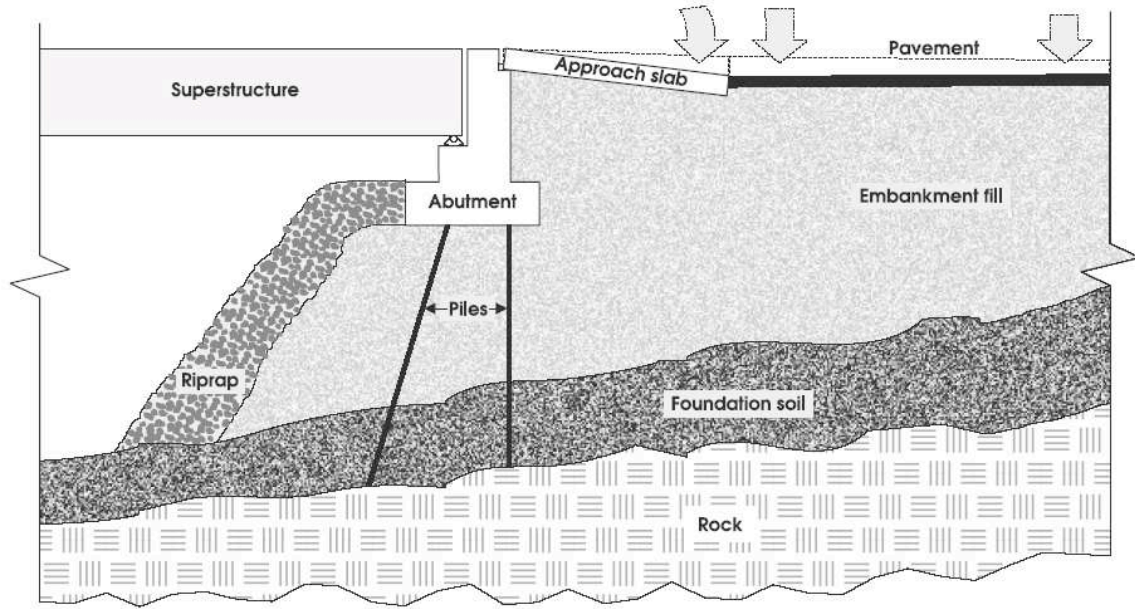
Methods of Minimizing Damage to Abutment Foundation
